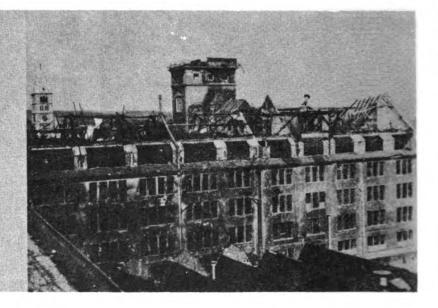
Danage to reinforced concrete roof deck of building 41. Note corrugated steel sheets for roof repairs, of floor below.
